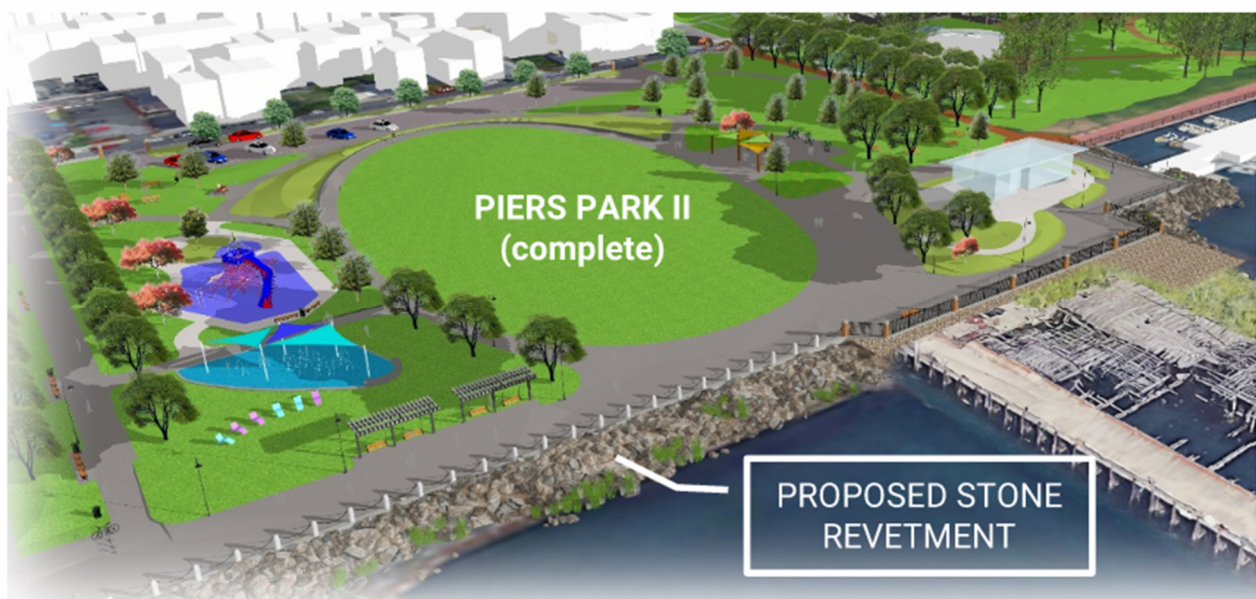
3D Rendering of Proposed Revetment as Related to Piers Park II, Aerial View
